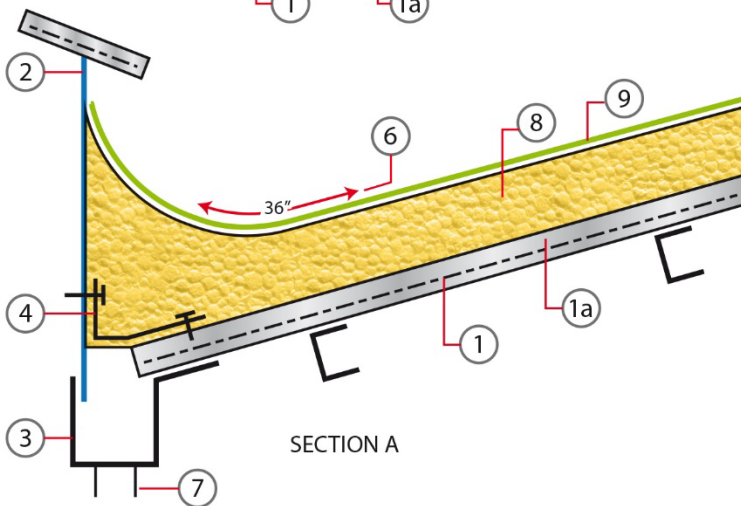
, EXISTING STUCCO PARAPET WITH 'Z' BAR COUNTERFLASHING
